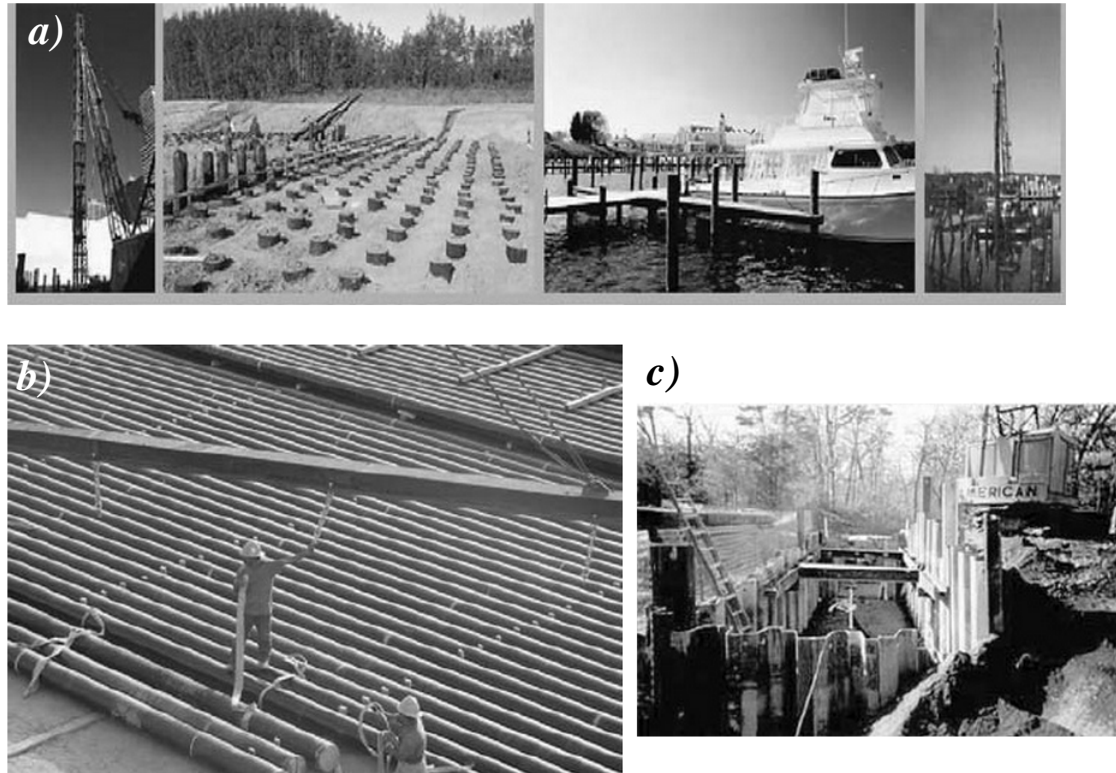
a) group of wooden piles in construction, b) production of precast concrete piles, c) steel sheet piles in a cofferdam application (Gunaratne, 2006)
